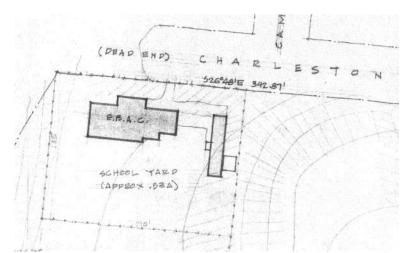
Detail of Building 8 and adjacent portable building in 1976 site plan. Source: Ratcliff Slama Cadwalder Architect, "Site Plan Lincoln Child Center," dated January 1976.
